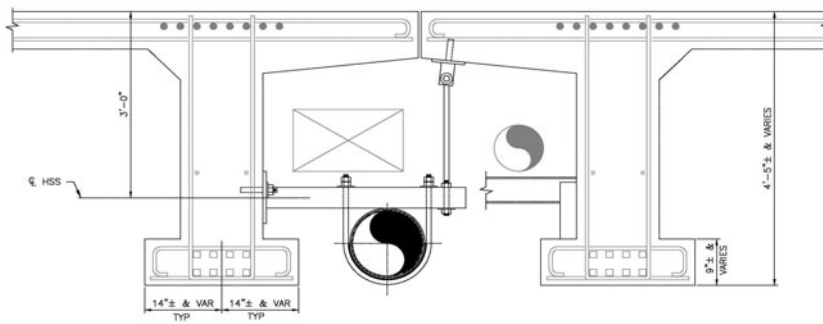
Detail for L.A. River Bridge Pipe Hanger
